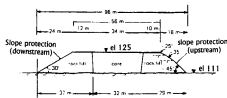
Cross-section of the Sadd-el-Kafara dam
